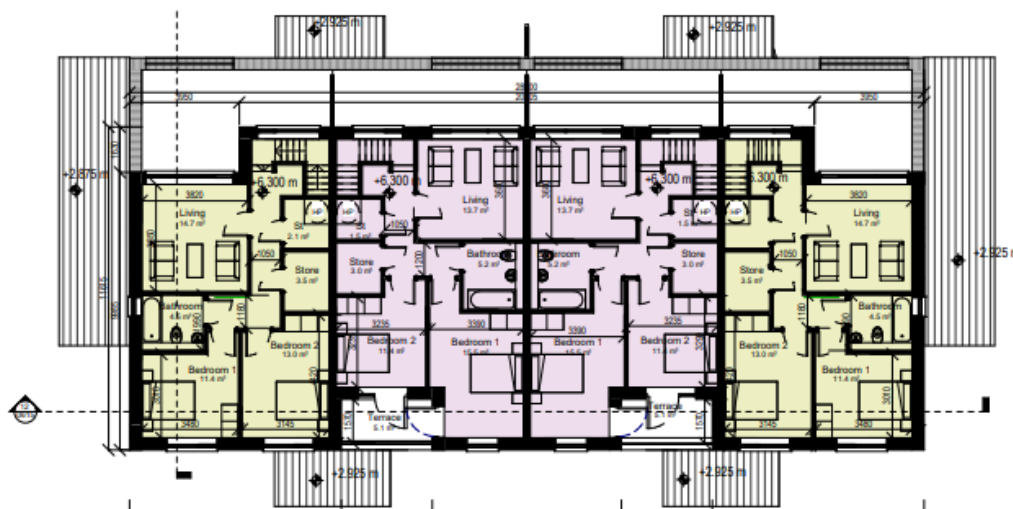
Proposed second floor plan of Duplex Block Type N
